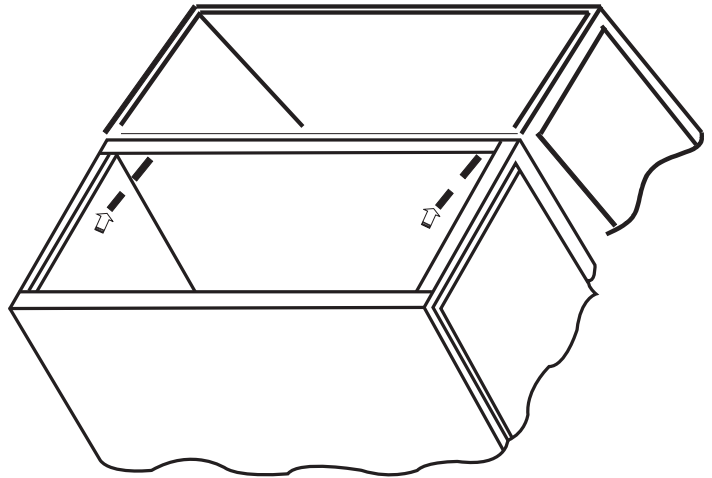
Attaching Furnaces Together at Return Air Opening A02219A
